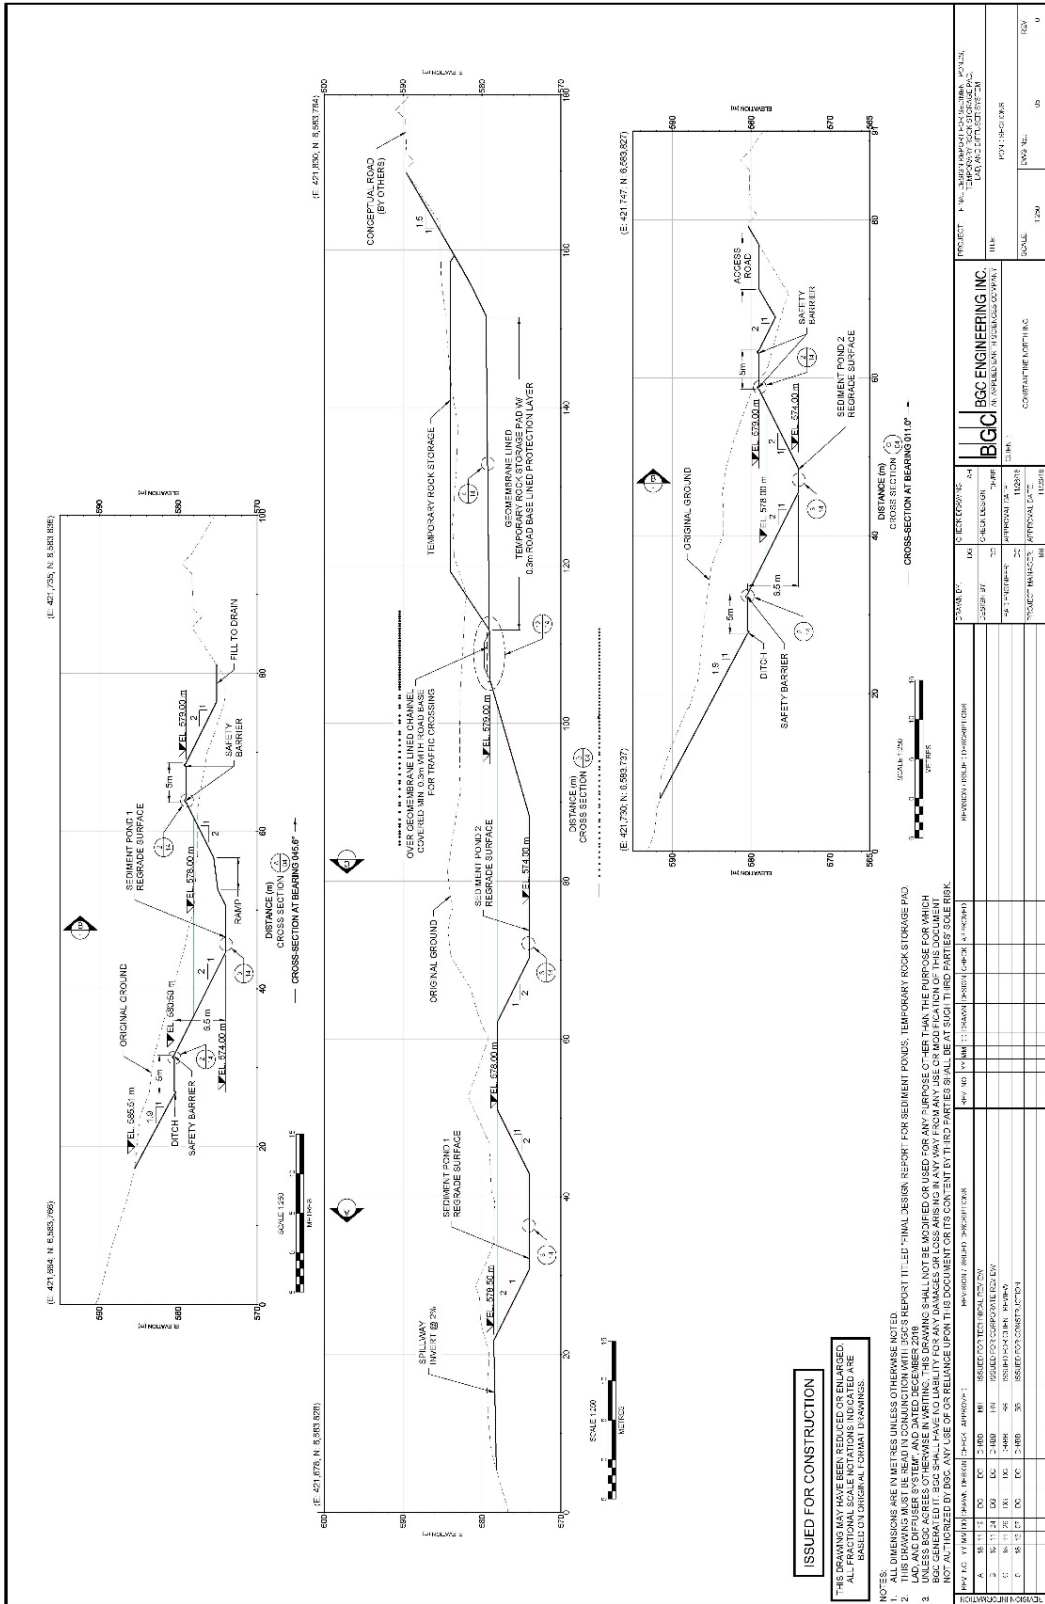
Engineered Drawings of Settling Ponds – Sectional View
